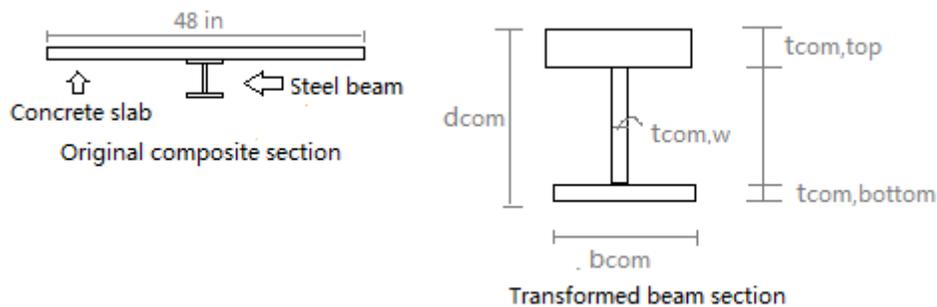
Sketch of Original Composite Section and Transformed Beam Section
